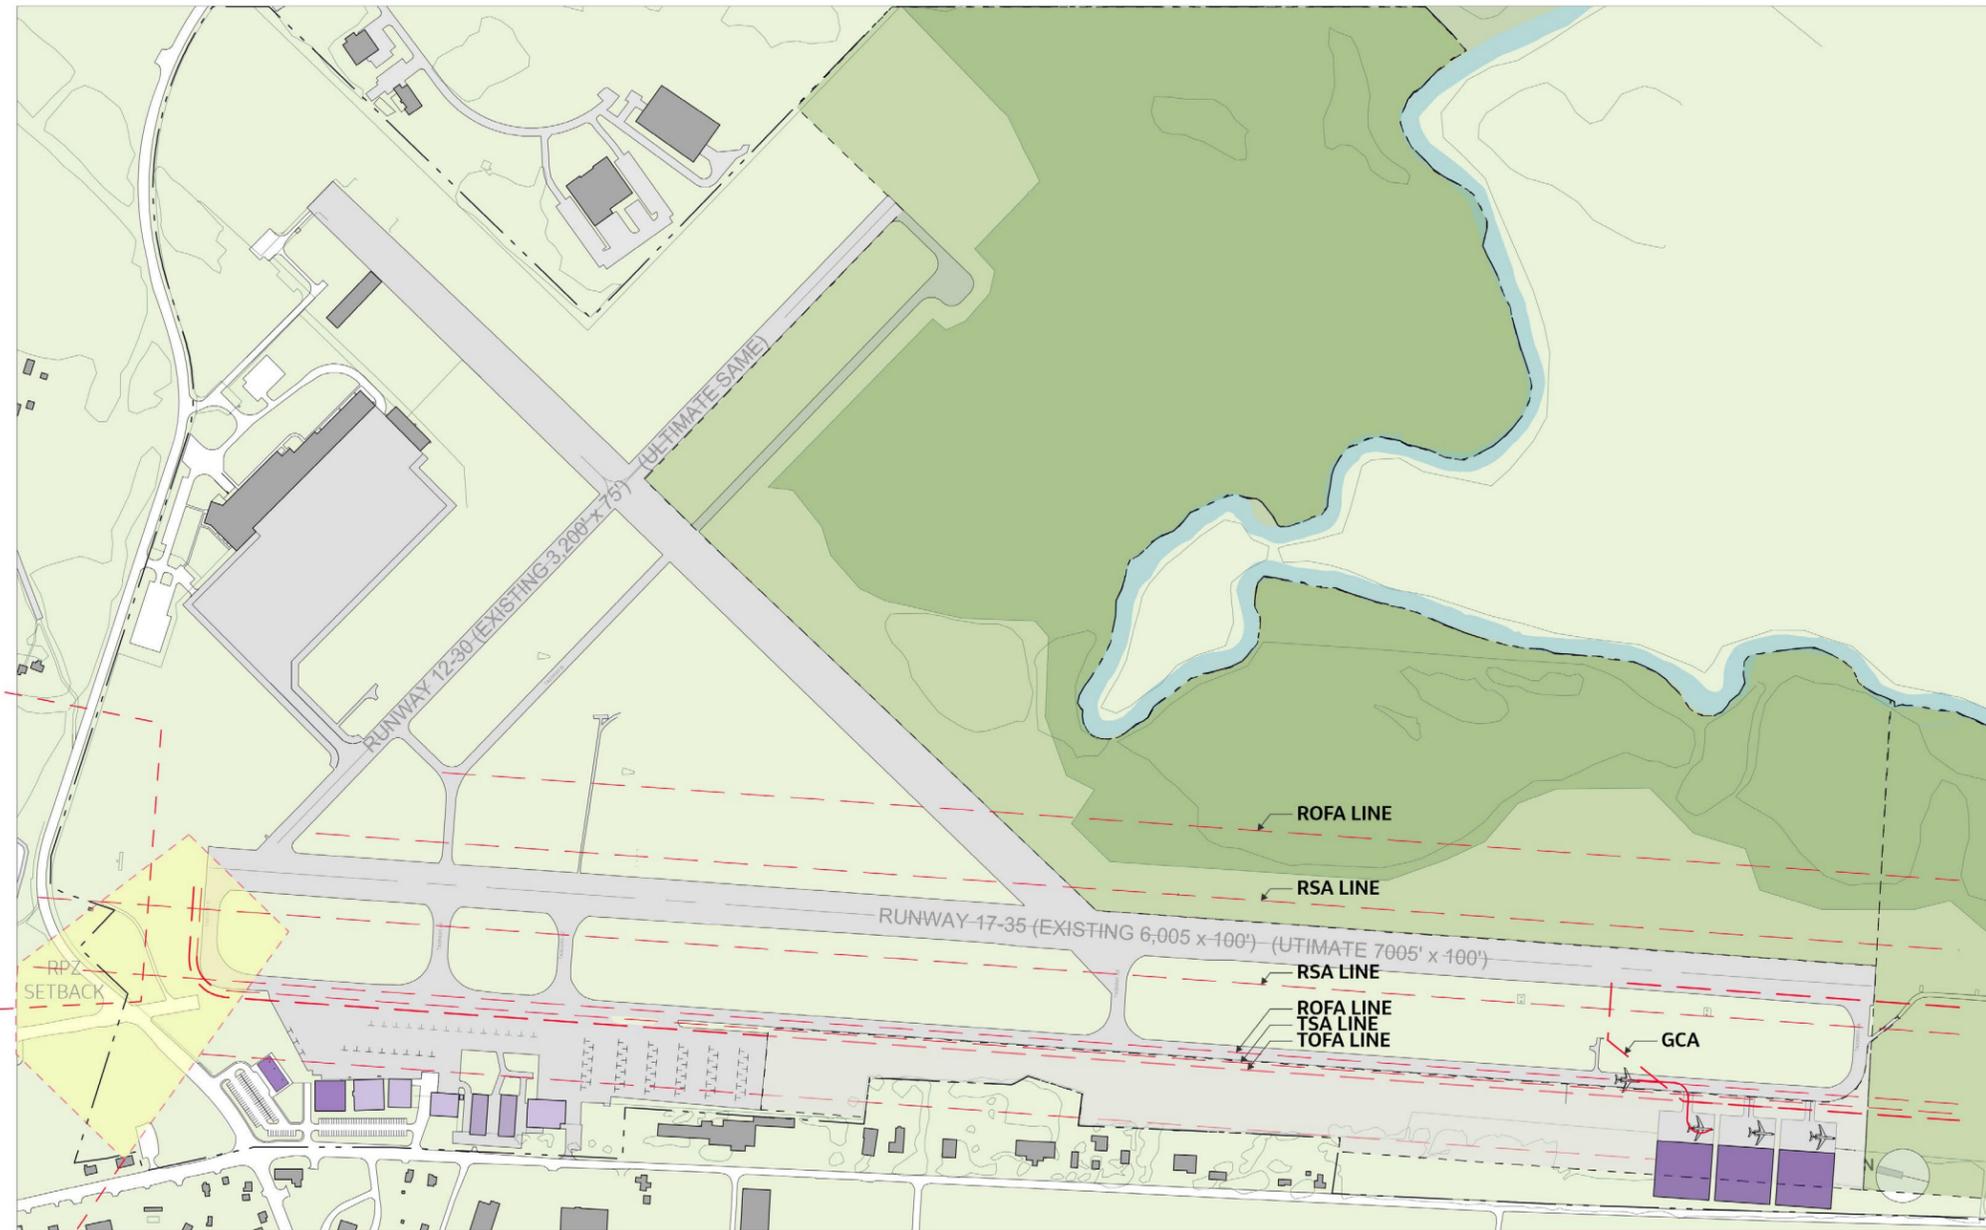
Concord Airport Site Plan and Proposed Hangar Development
